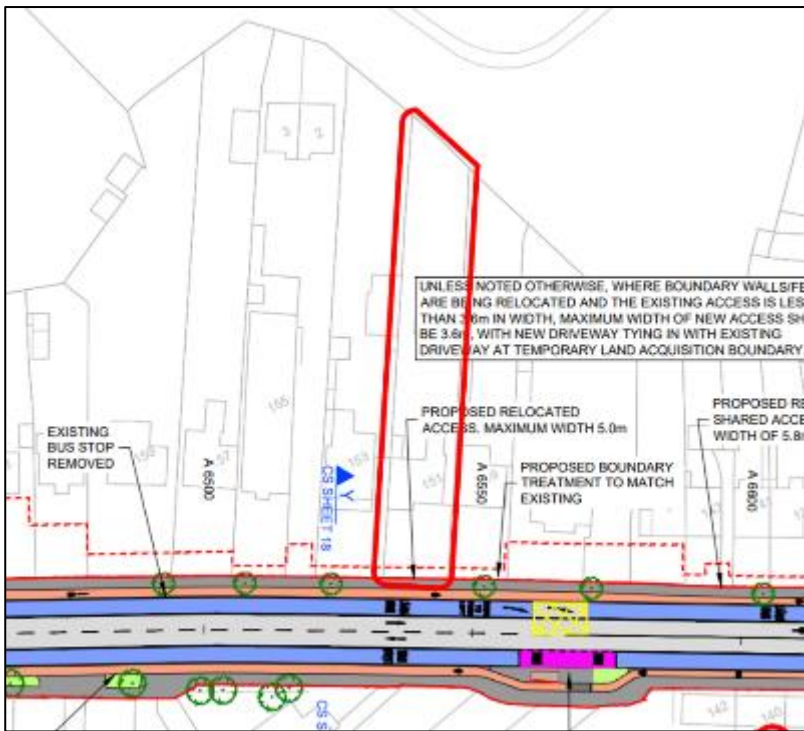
Proposed new Layout at 151 Navan Road
